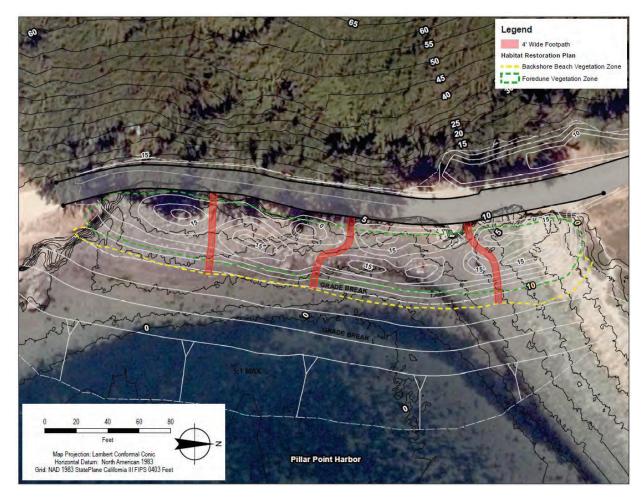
Site plan with pedestrian access to nourished beach from West Trail.
